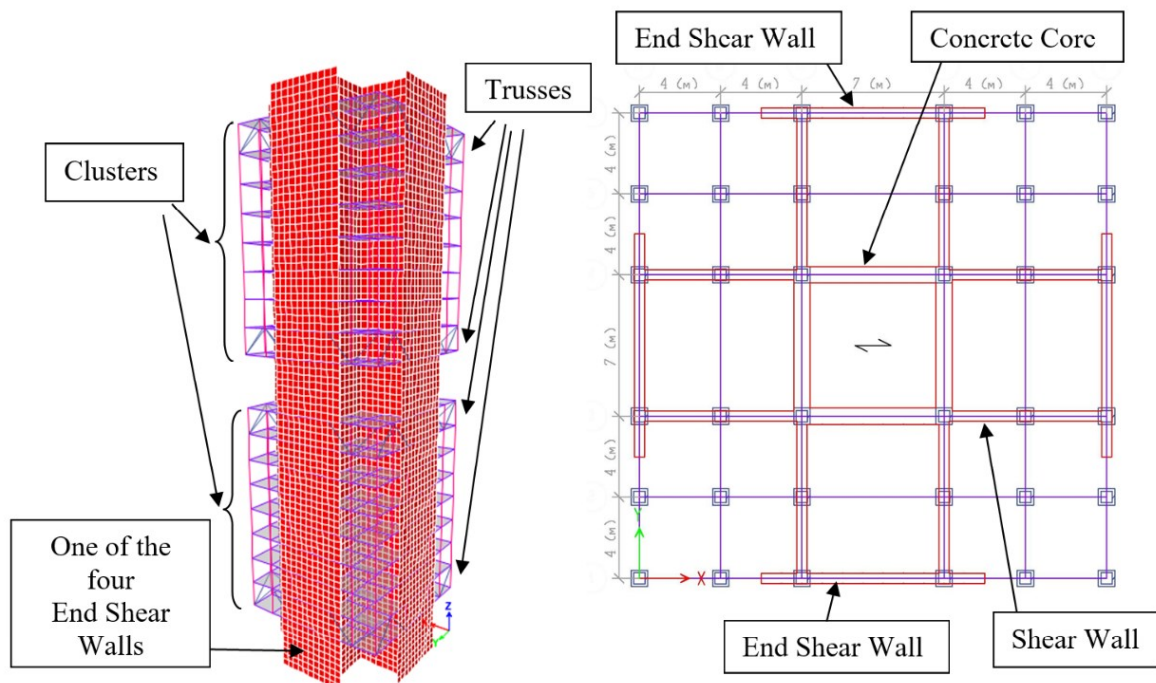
Three-dimensional view and plan of the suspended high-rise steel building with shear walls and end shear walls (SS3).
